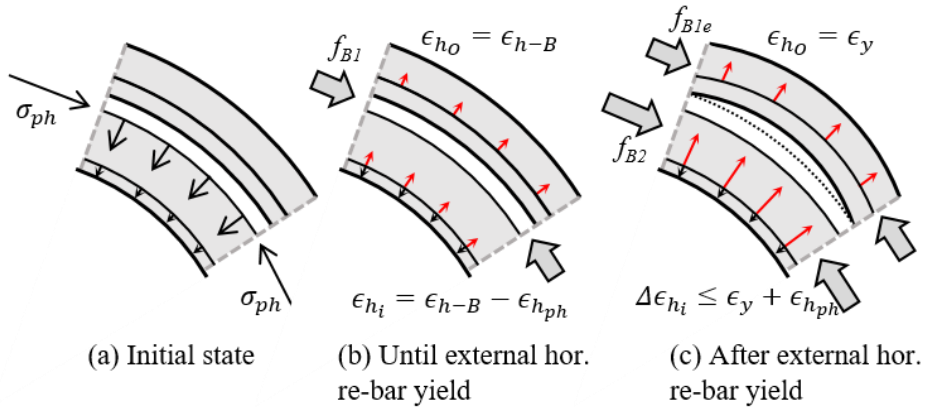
Failure procedure of cylindrical wall with delamination cracks
